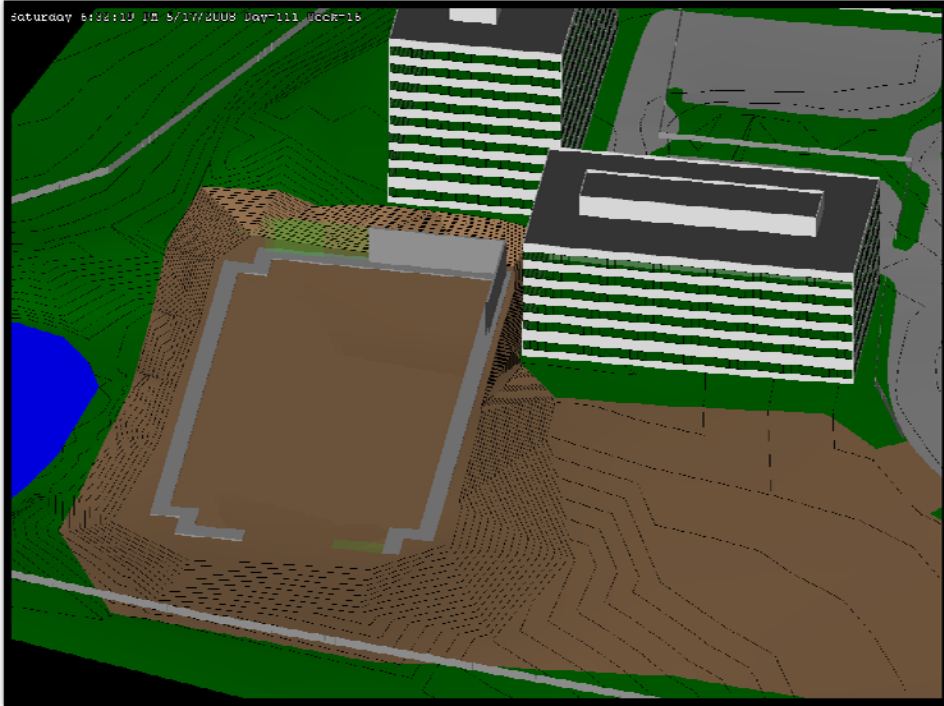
Phase 1 Footing and Foundation Wall Construction
